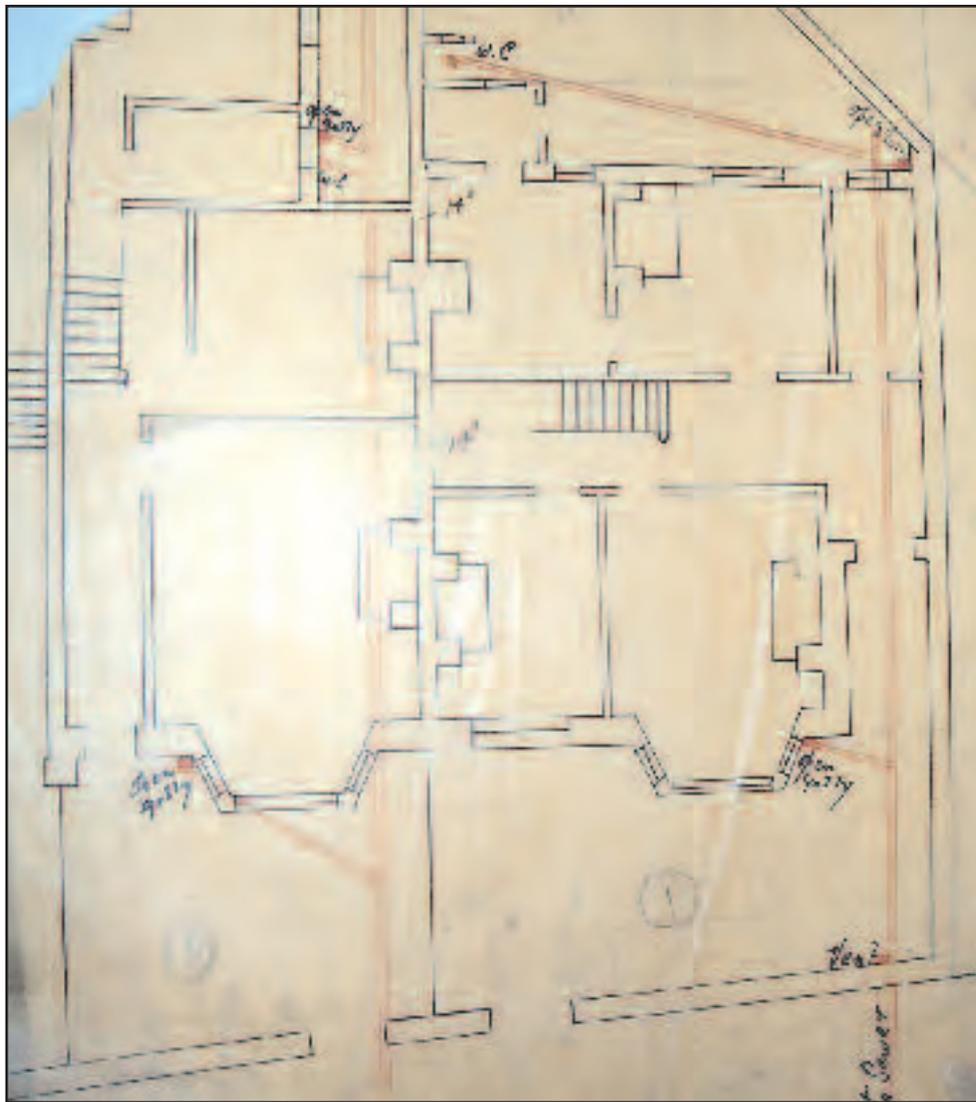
Ground floor plan of 99 & 101 Woodland Road, 1903
